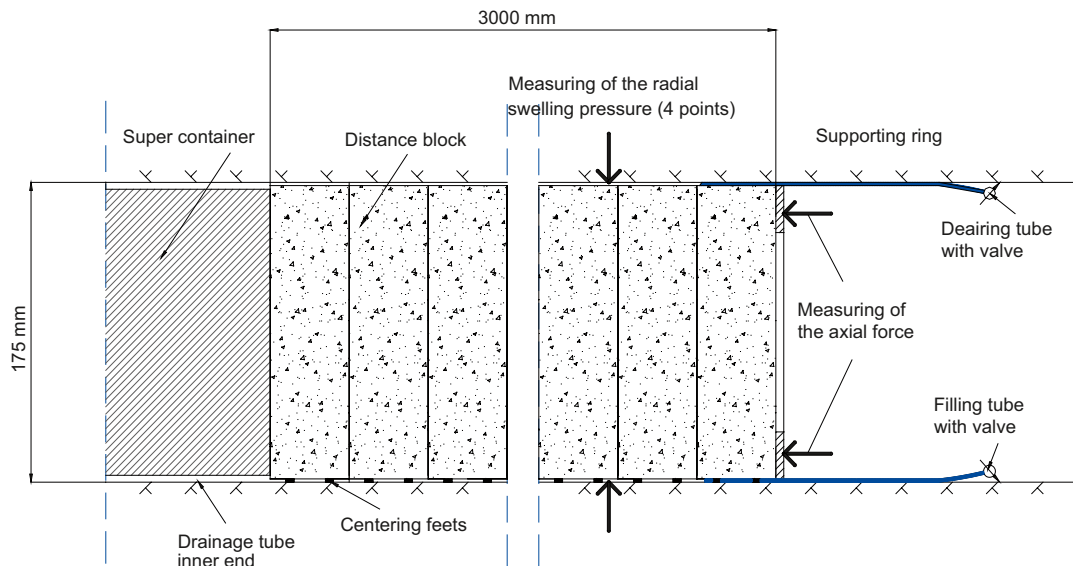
Schematic drawing showing the test layout for test III-31.
